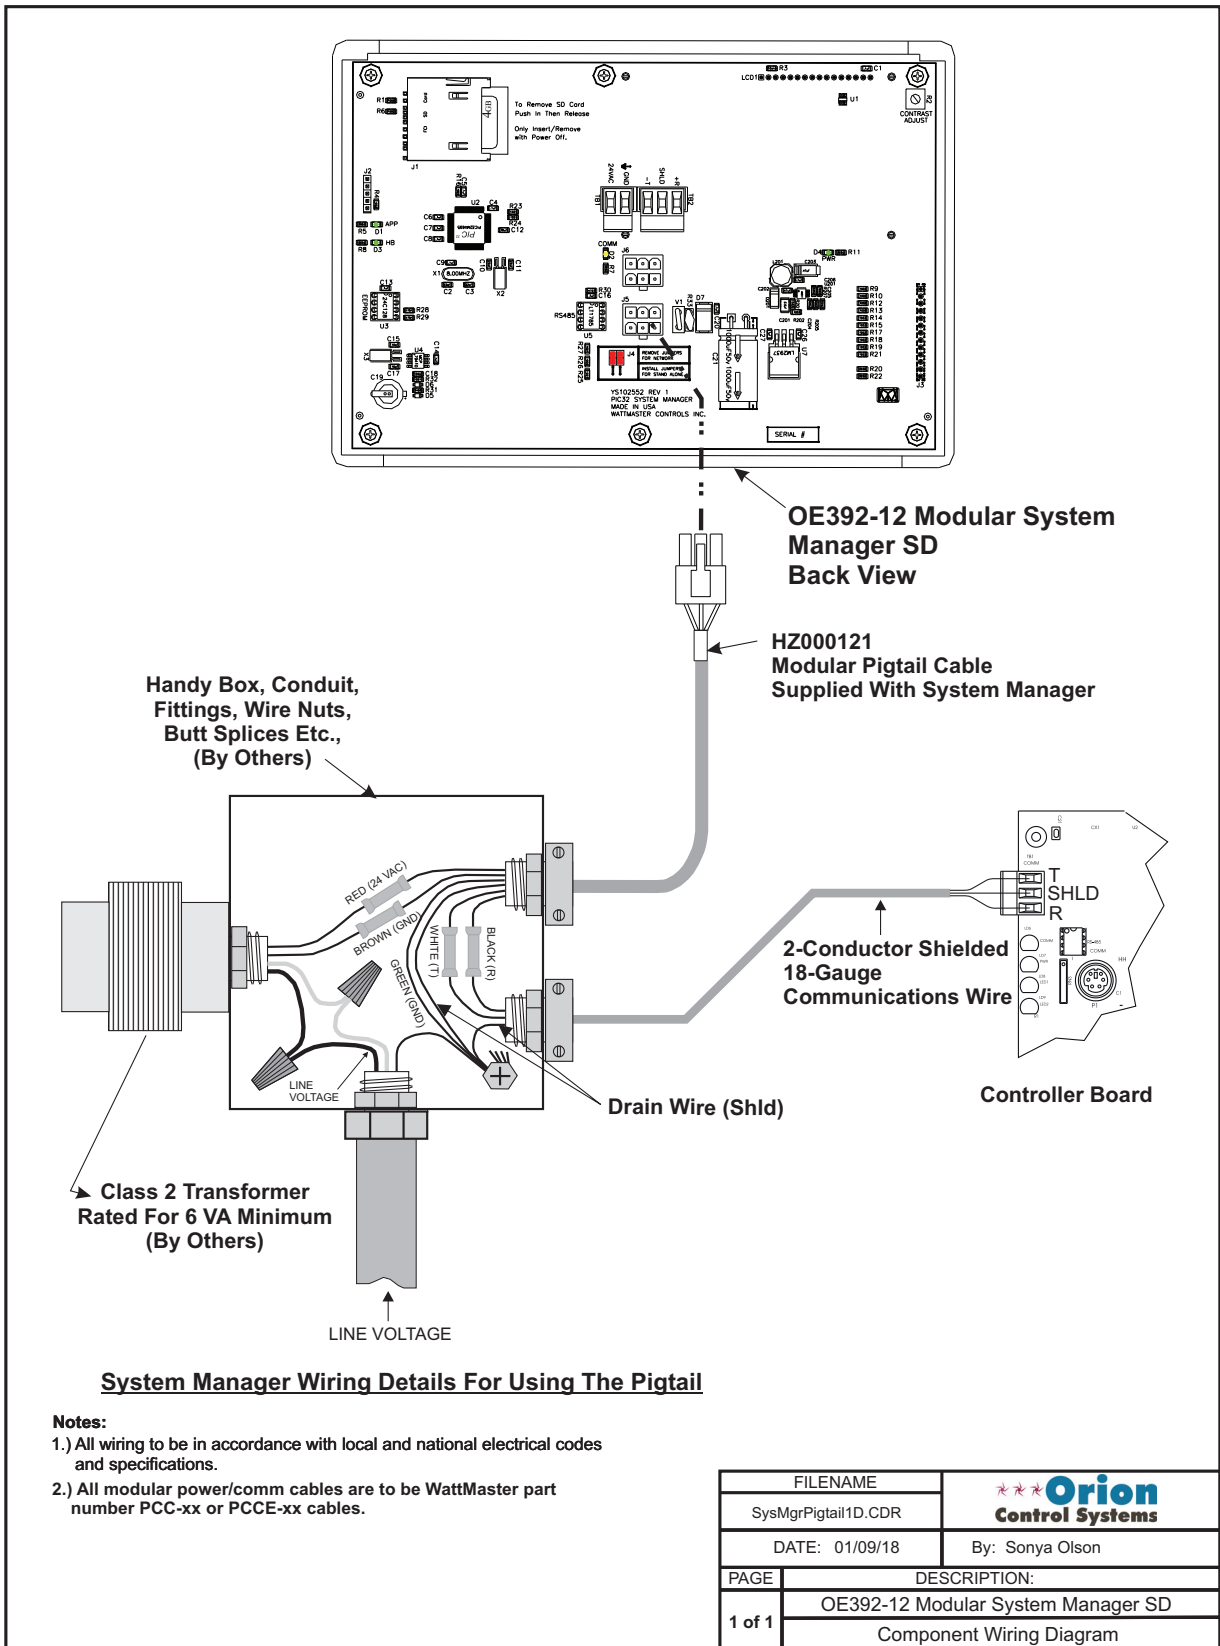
OE392-12 Modular System Manager SD Cable Pigtail - Wiring Detail
